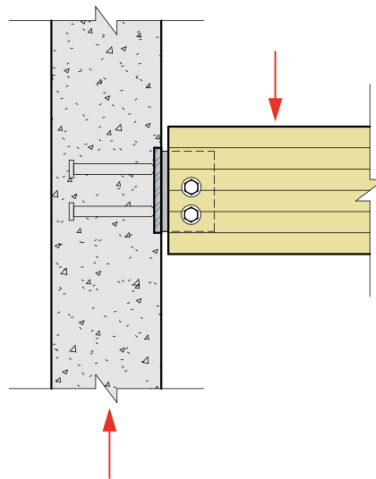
Connection with a steel knife plate in the timber beam. Taken from WoodWorks (2021)
